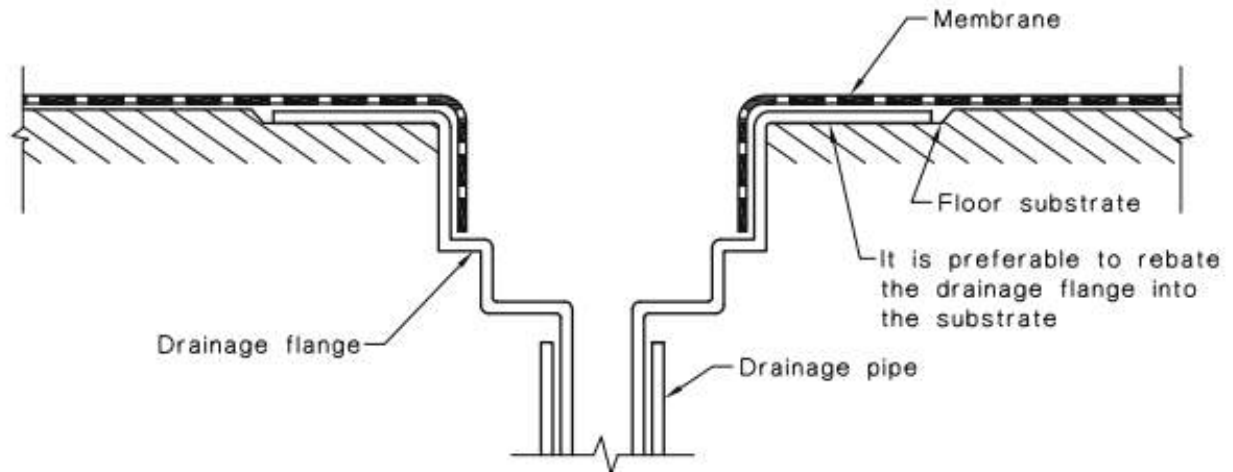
TYPICAL MEMBRANE TERMINATION AT DRAINAGE FLANGE
